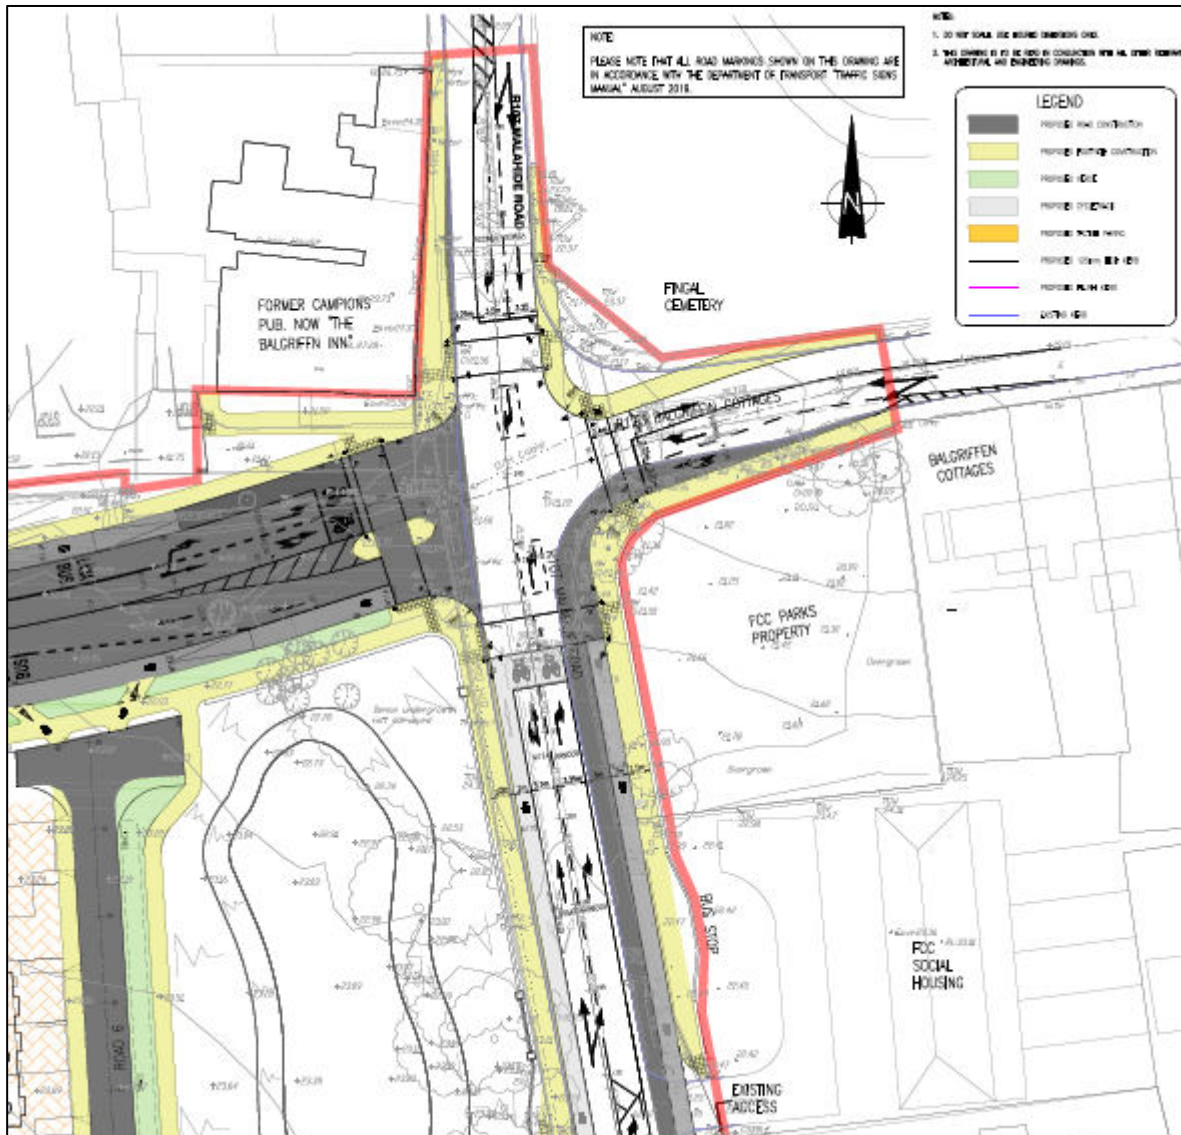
| Malahide Road (R107) / Balgriffin Road – New Layout
